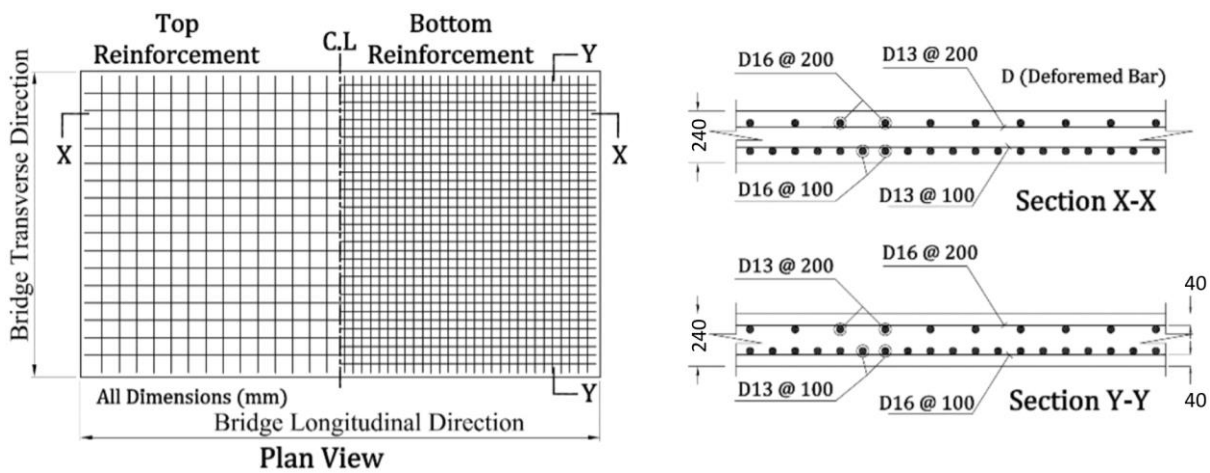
Dimensions and reinforcement of the RC deck of the bridge
